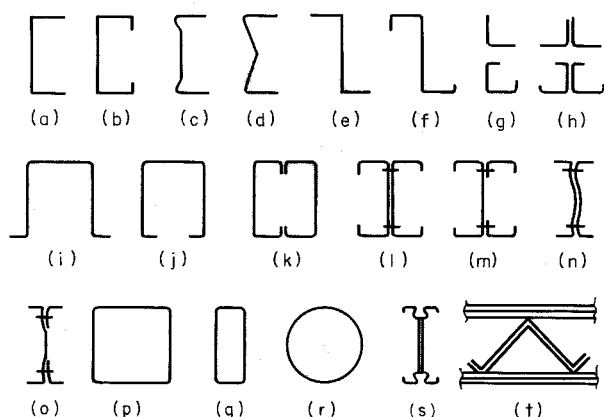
Cold-formed sections used in structural framing.^{1,6}
